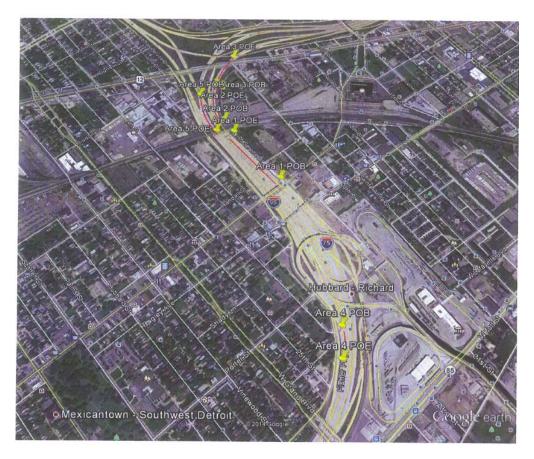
General Site Layout of I-75/I-96 Test Areas
